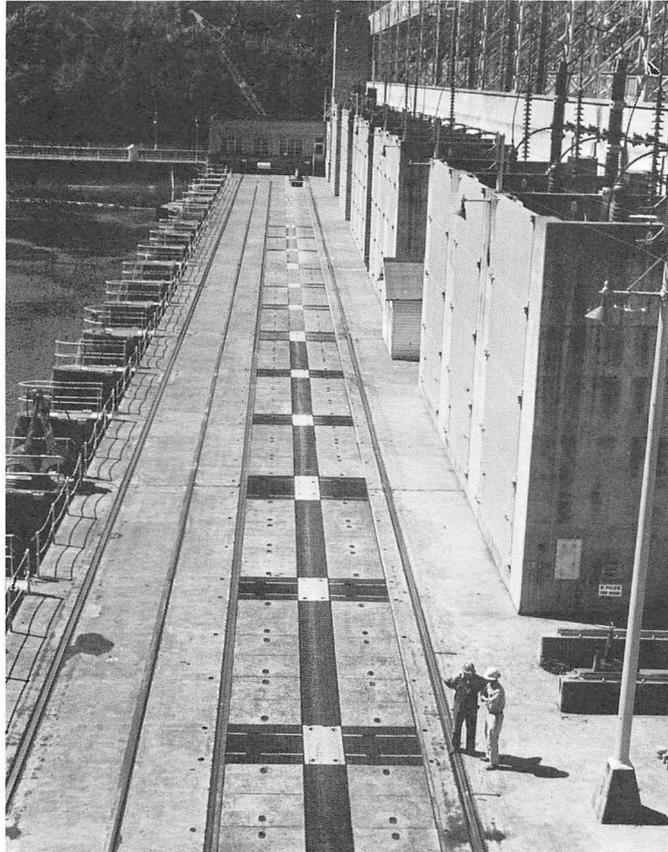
Concrete slab and steel grill covers on intake gatewells at Bonneville Dam.
